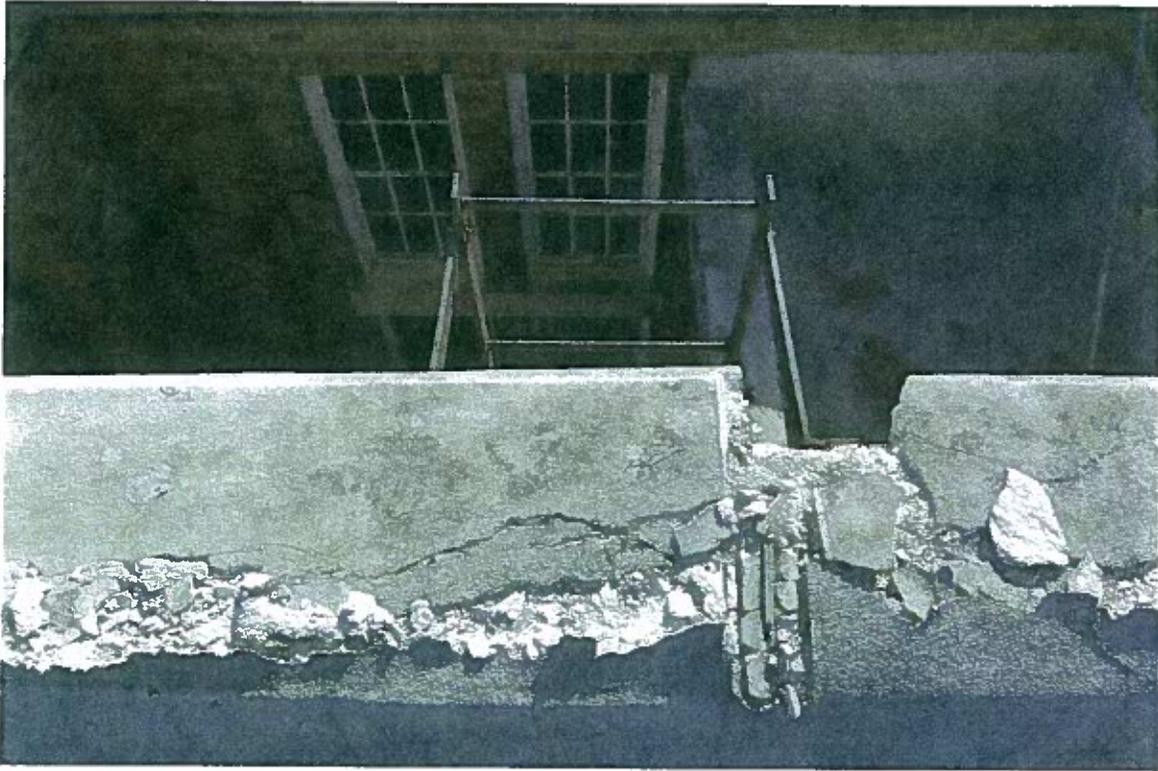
Spalling and cracking of Indiana limestone parapet from moisture trapped by the roofing membrane running up and over the coping.
